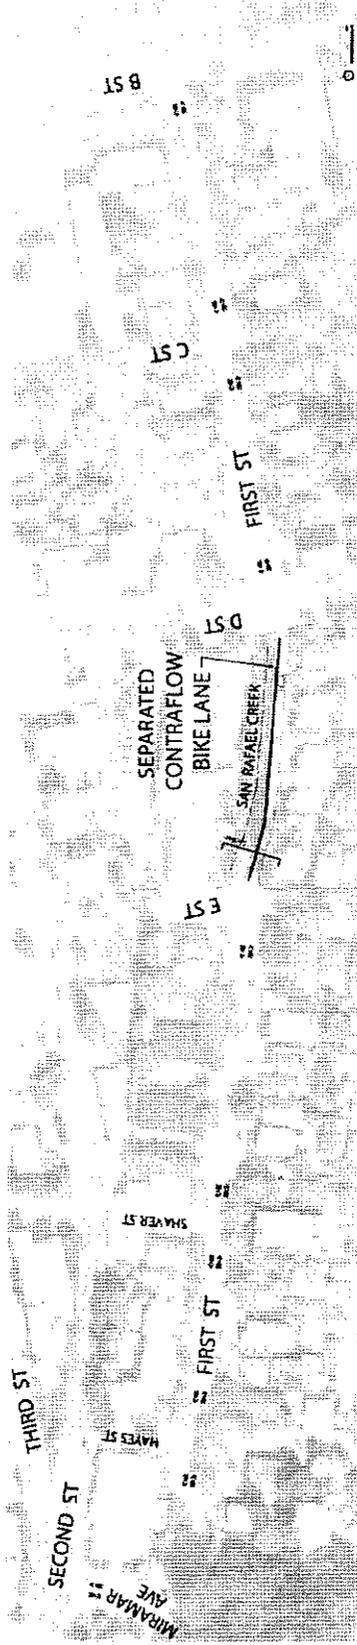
Plan View of Proposed Improvements for Project 13: First Street (Second Street to B Street)
